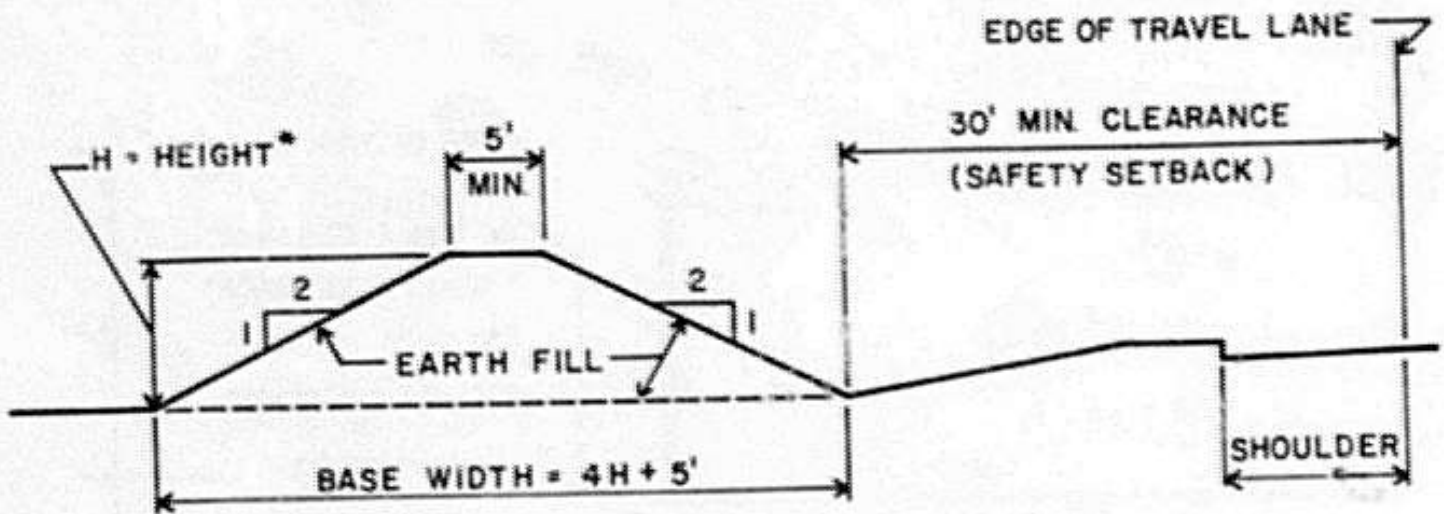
TYPICAL CROSS-SECTION, HIGHWAY-NOISE BARRIERS TYPE 1 THRU 3
